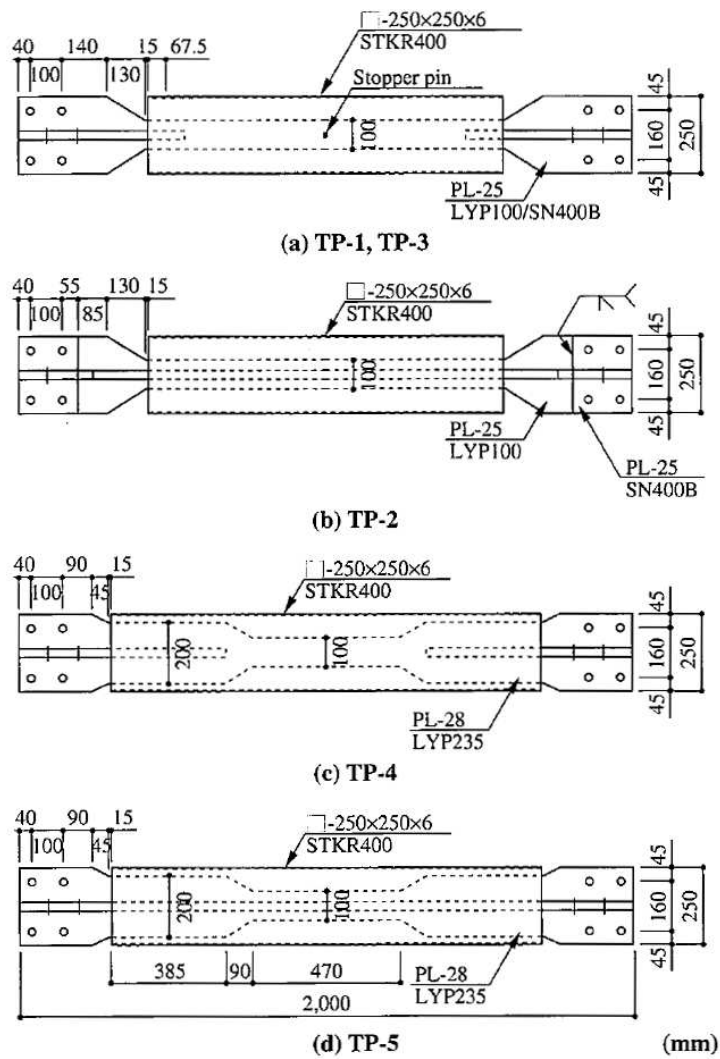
Detail drawings of Nakamura et al. test specimens [8]
